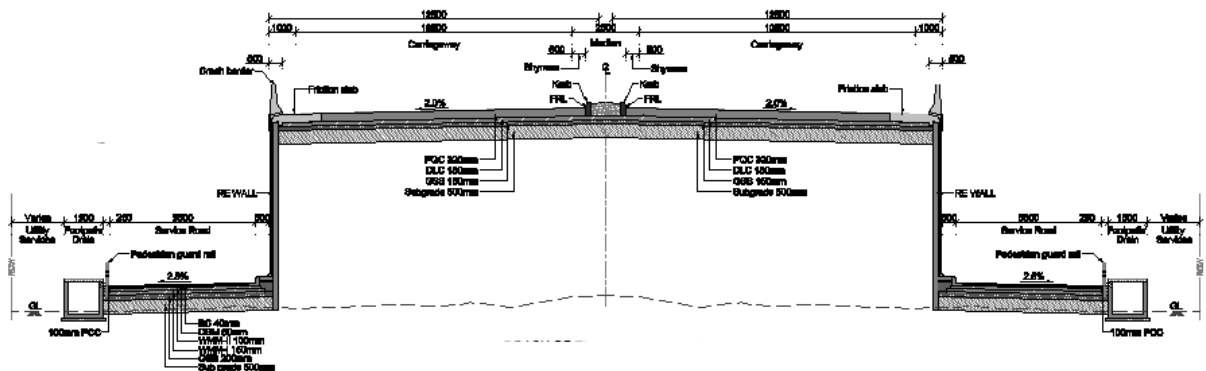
TCS 10.2- Approach Of Elevated Structures
